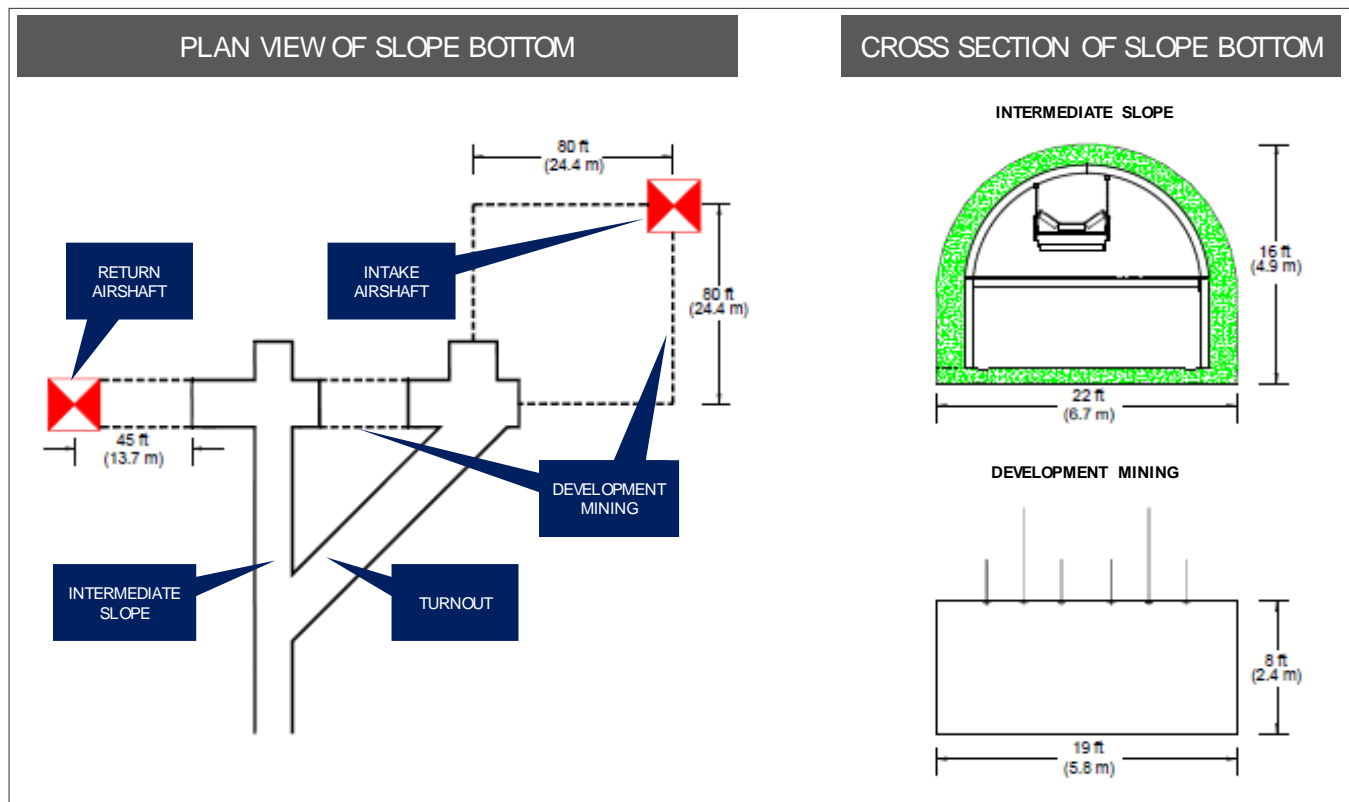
Plan and cross-section of the slope bottom and initial mining area layout
